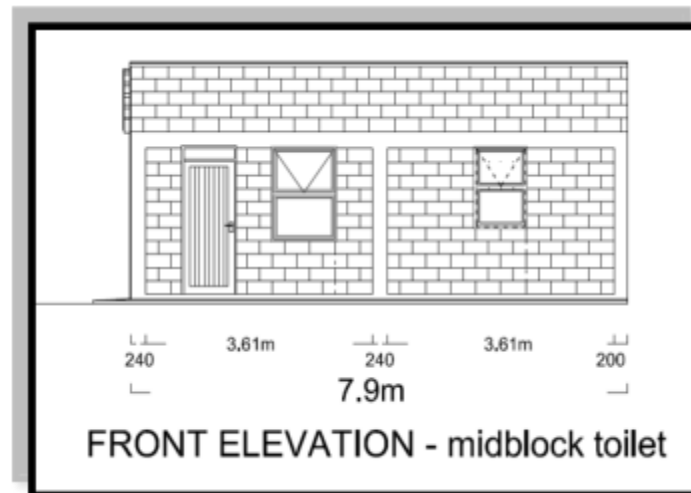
TYPOLOGY B - FRONT ELEVATION
